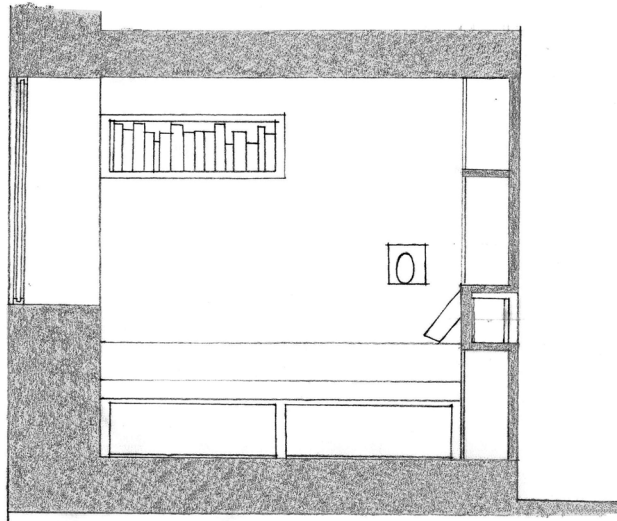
Sectional elevations of box beds showing in built furniture and storage space 1:50
